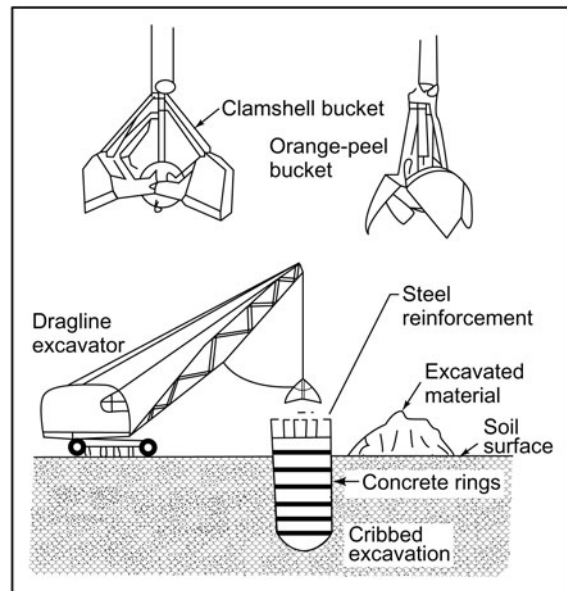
Schematic sketch illustrating the construction of open wells using a dragline excavator equipped with orange-peel clamshell bucket. A crane of simple design, operated by a 7.5 h.p. diesel engine or 5 h.p. electric motor and provided with a manually loaded open bucket is popular in well digging in Andhra Pradesh and neighbouring regions
